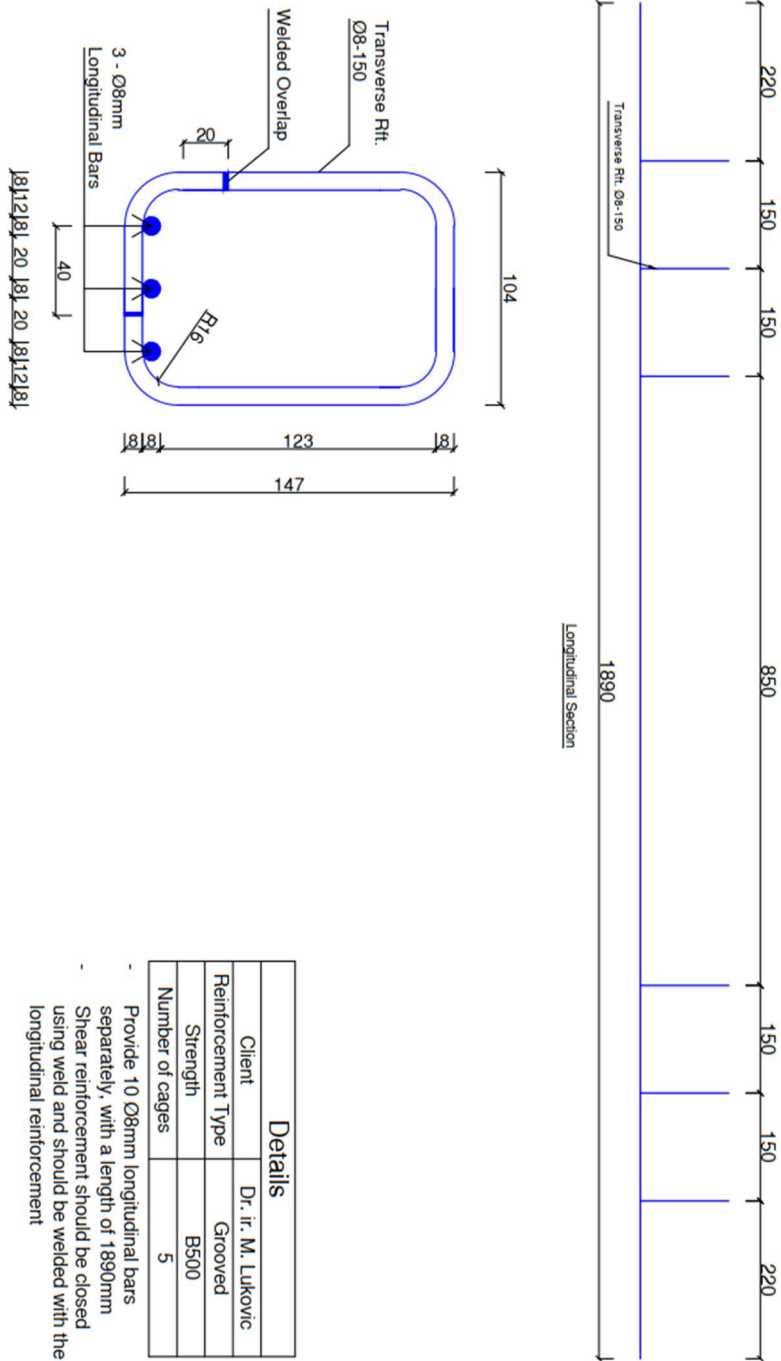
reinforcement design of large scale experiment hybrid beam containing a U-shape
